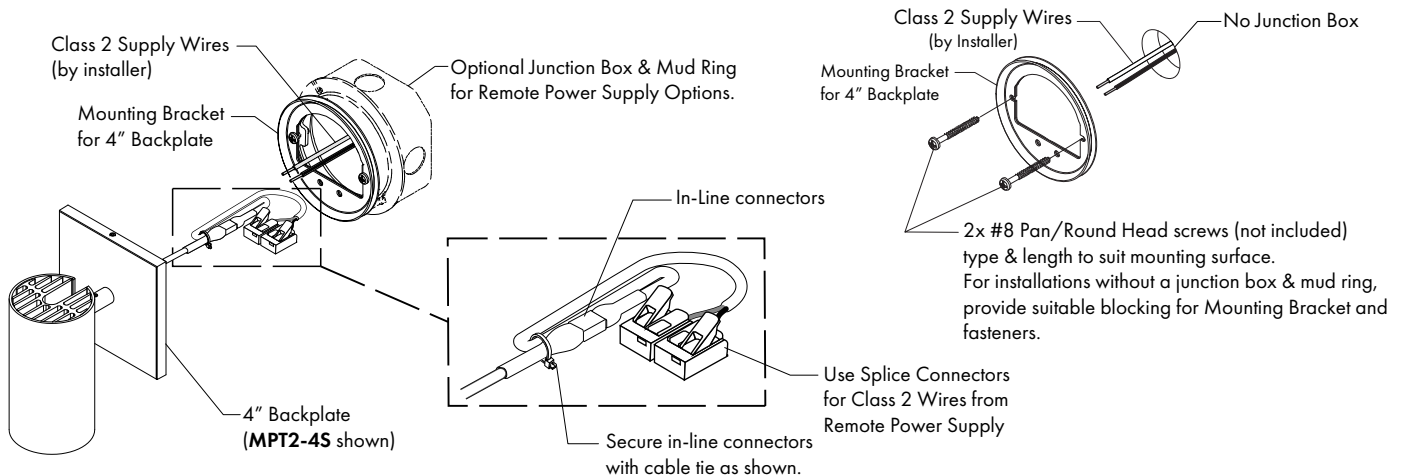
Wire & Install Fixture (4" Backplate) - With & Without Junction Box
